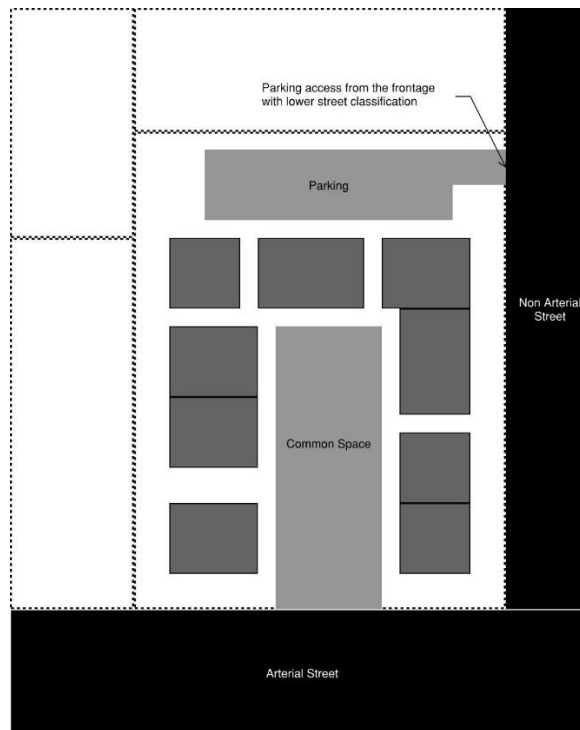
(A)(1): Cottage Setbacks and Building to Building Placement
